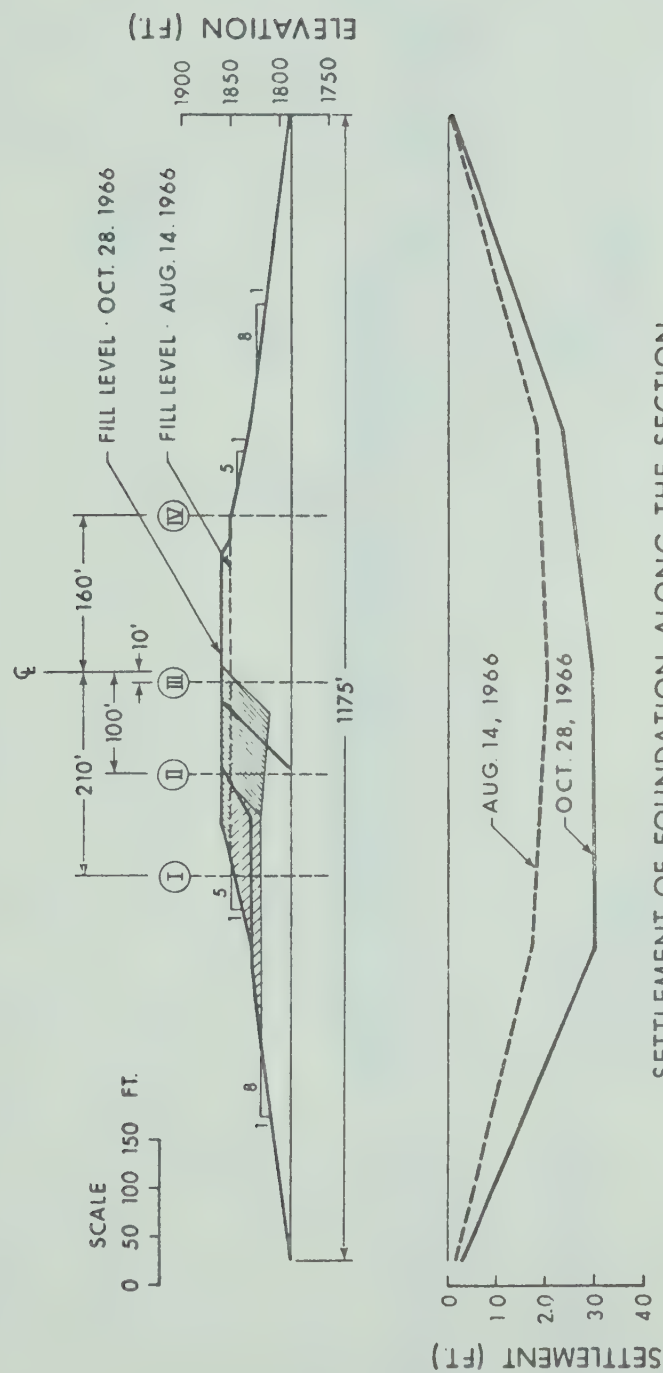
SECTION OF DAM AT A DISTANCE OF 440 FEET FROM LEFT ABUTMENT SHOWING APPROXIMATE ZONES IN WHICH CRACKS DEVELOPED PROGRESSIVELY
